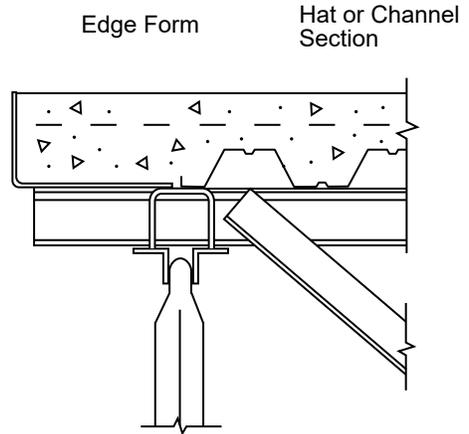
SINGLE PIECE EDGE FORM PARALLEL TO DECK ON OPEN WEB JOIST GIRDER
